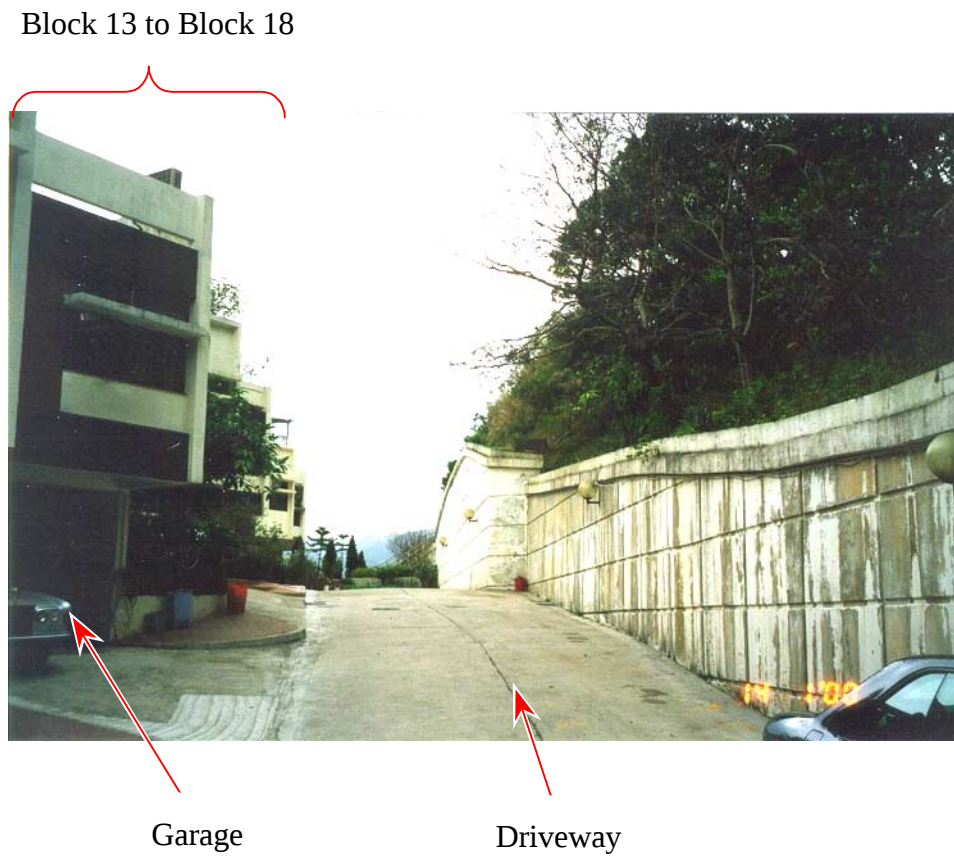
Residential Flats, Garages and Driveway of Blocks 13 to 18, Woodcrest Hill
